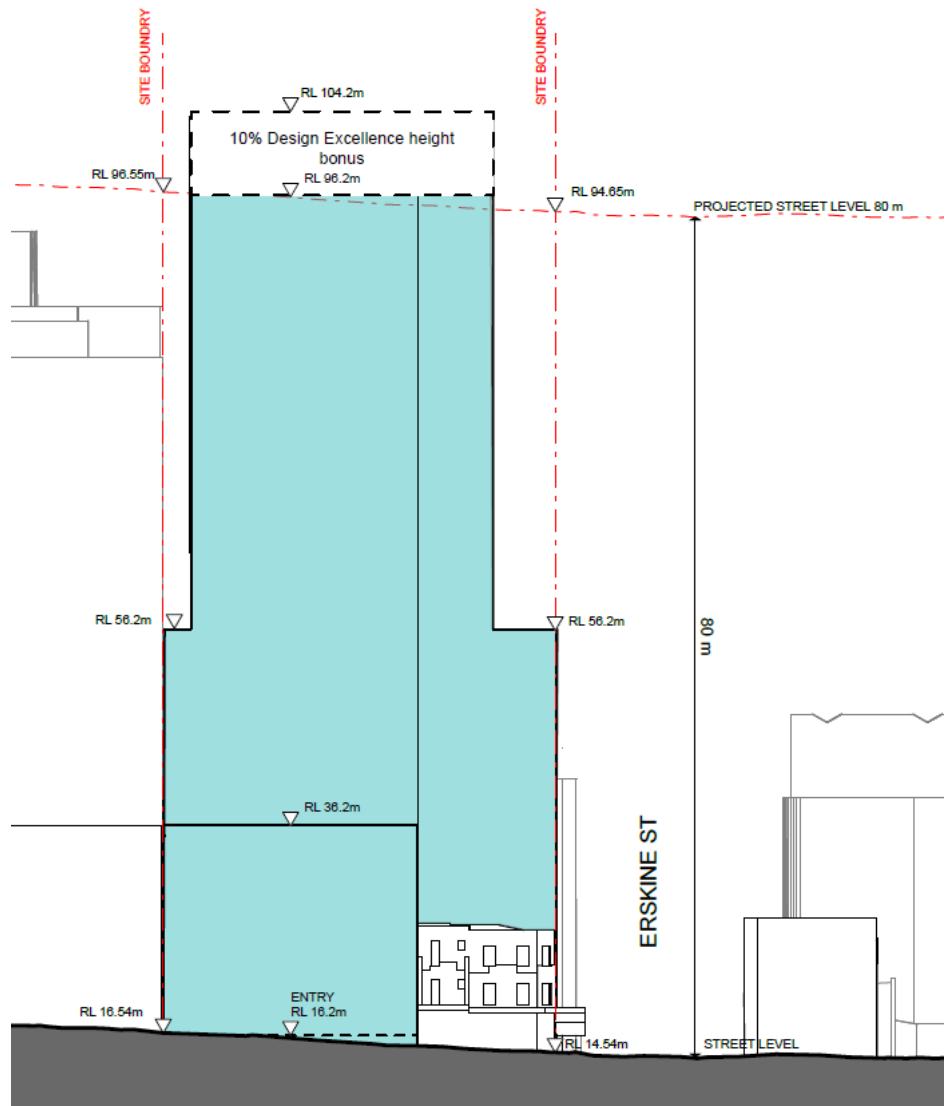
Proposed Building Envelope East (Kent Street) Elevation
